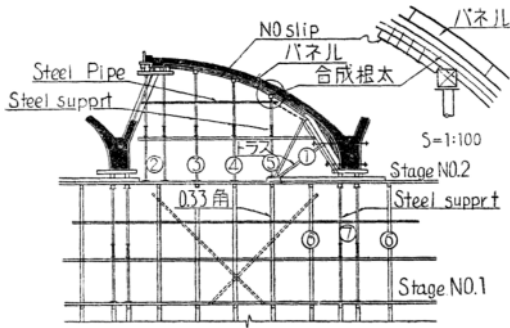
Section of formwork of tooth shell roof (Tsuboi et al. 1954).
